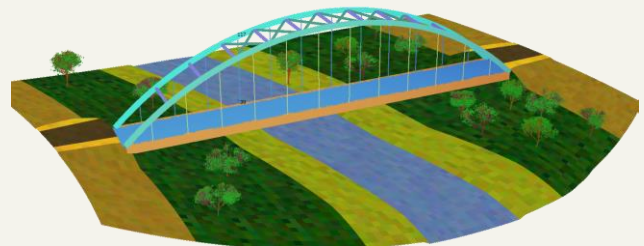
Tied-arch railway bridge [150 m] (Eirini Mparouta, MSc, 2023)
